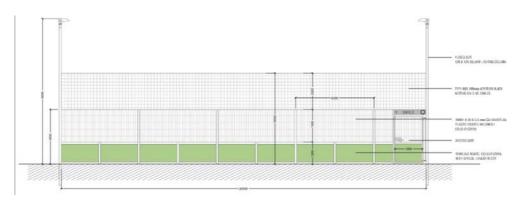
Pitch enclosures with kick-board, netting and floodlight columns
